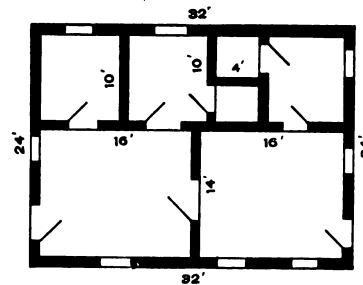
Floor Plans of a One Story Cottage, Showing Walls and Partitions.
